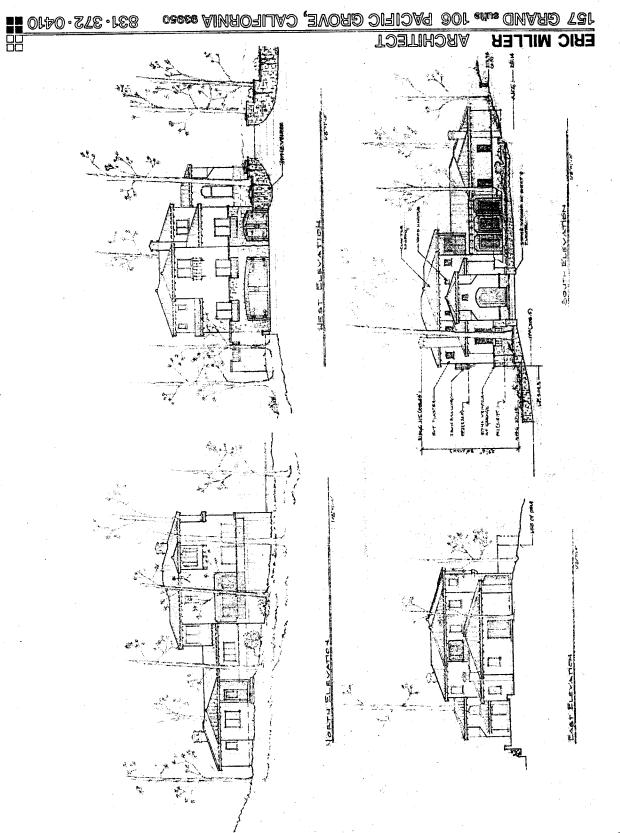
of 2 Proposed Lot Line Adjustment and Site Plan/Elevations for Proposed Development
